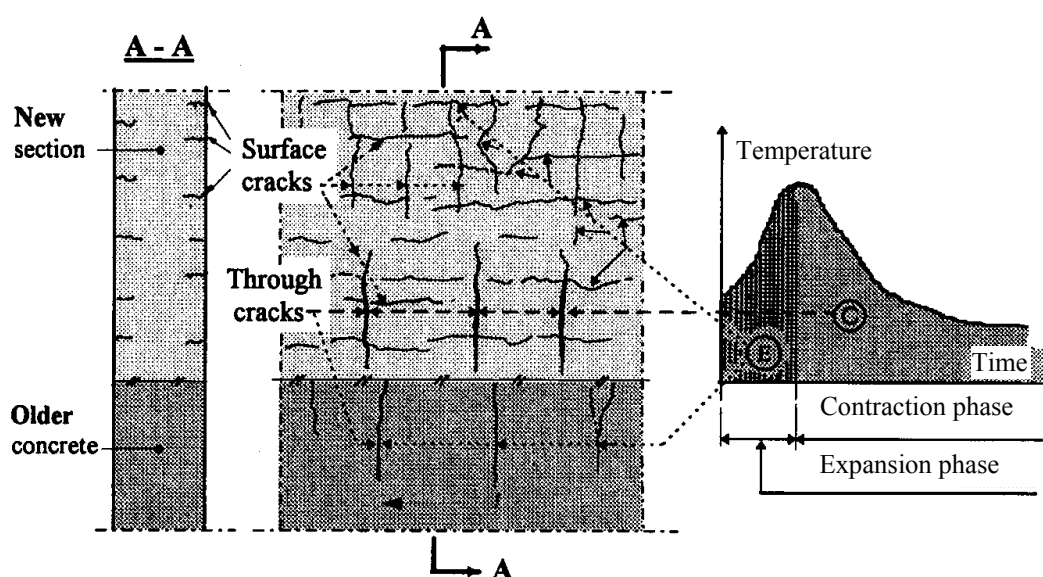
Exemplification of early age expansion cracks and contraction through cracks in a symmetrical wall cast on alder concrete [after Bernander (1998)].
